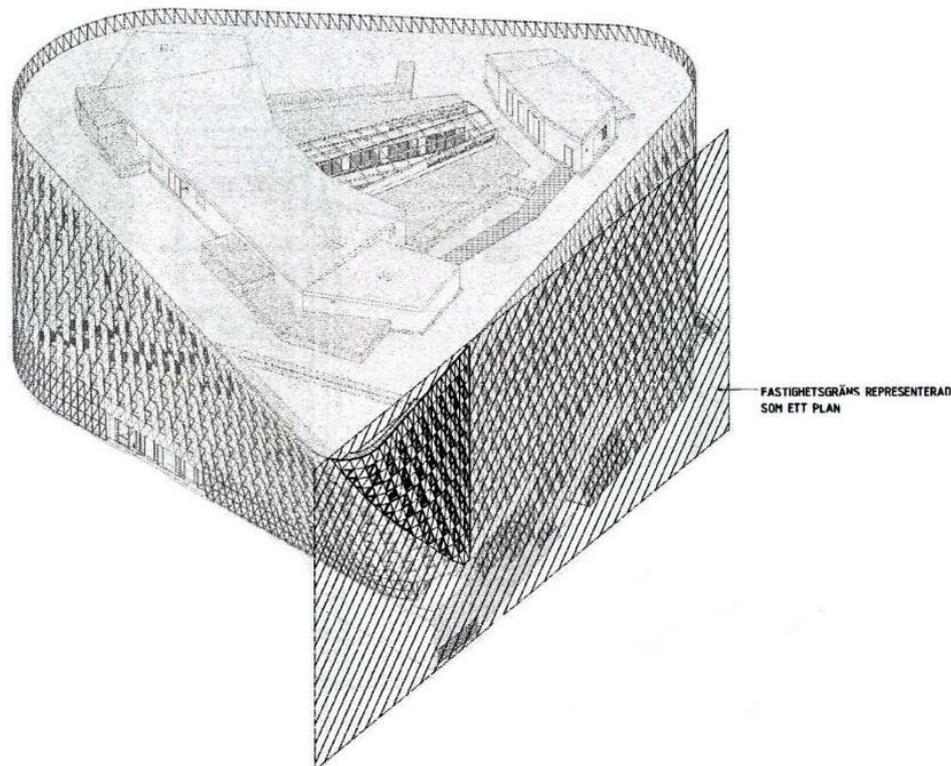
3D boundary shown as a vertical plane cutting through a building on a 3D construction drawing, being enclosed in the legal survey documents. Based on Lantmäteriet (2014)
